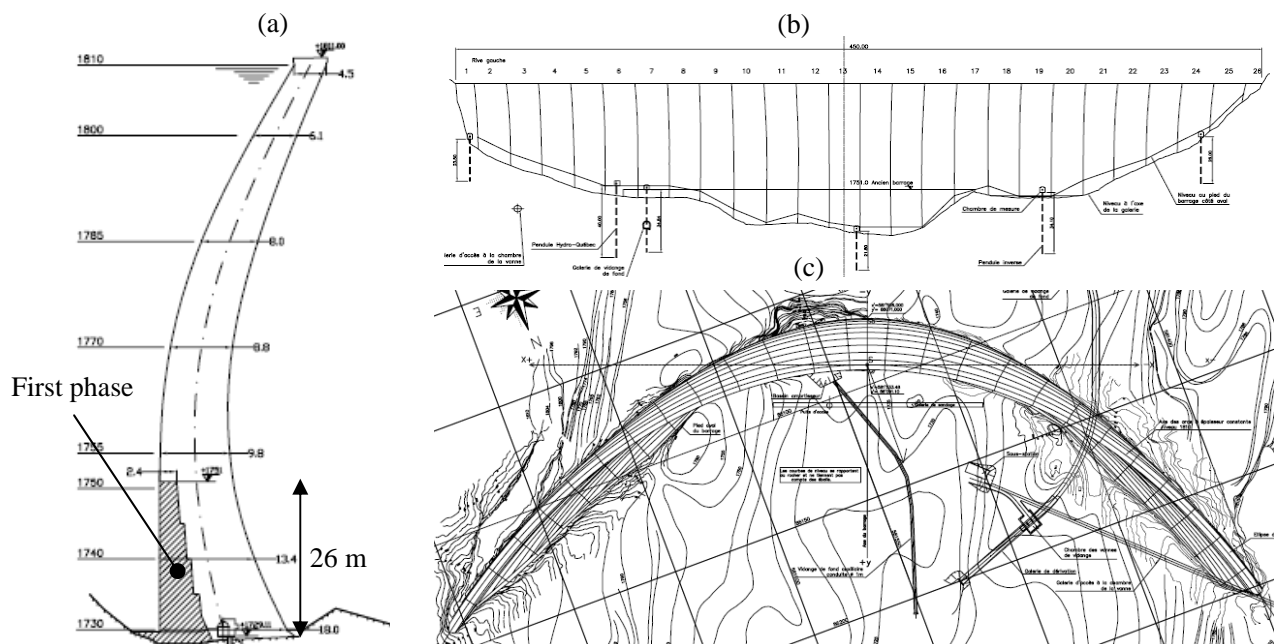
Les Toules double-curvature arch dam, (a) Crown Cantilever, (b) Developed upstream Elevation, (c) Situation
